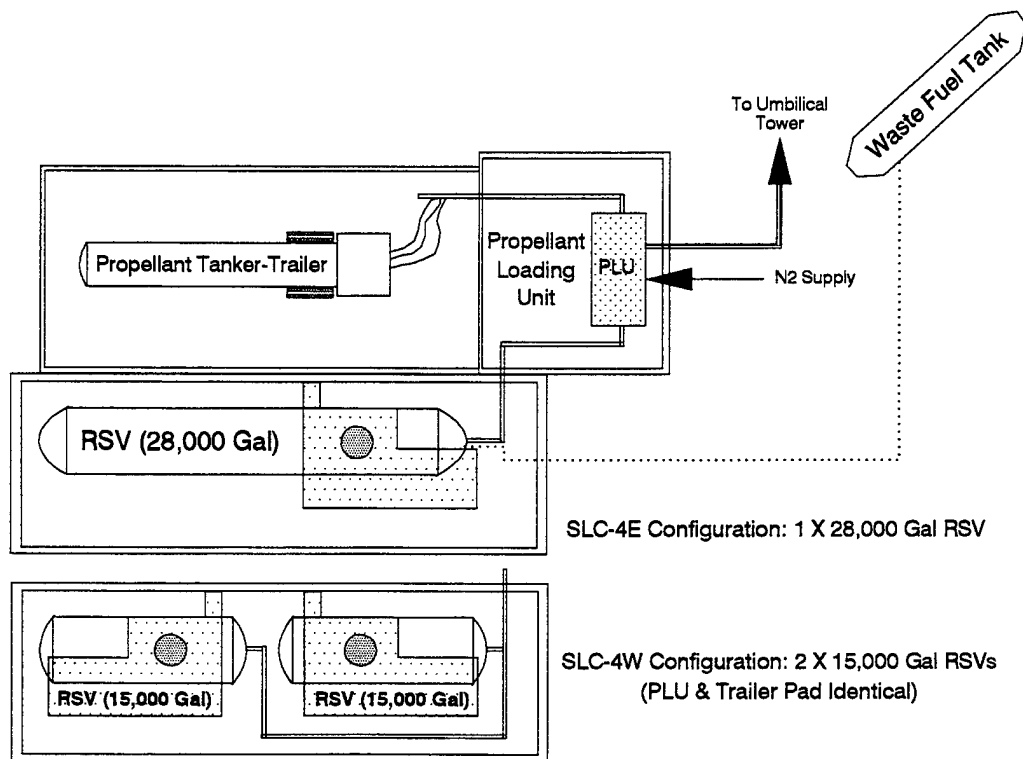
VAFB Titan Fuel Holding Area (FHA) Site Plan.
